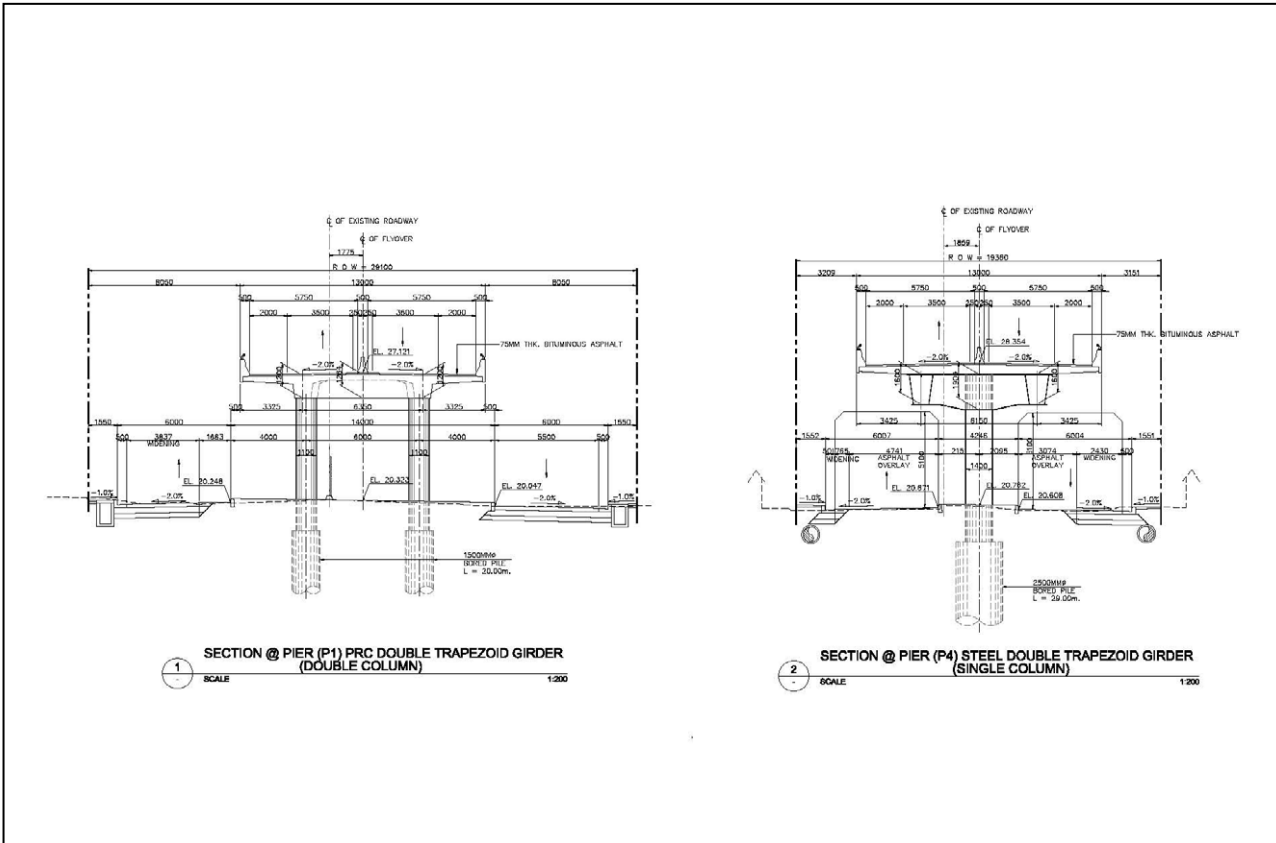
TYPICAL CROSS SECTION (BALARAJA)
